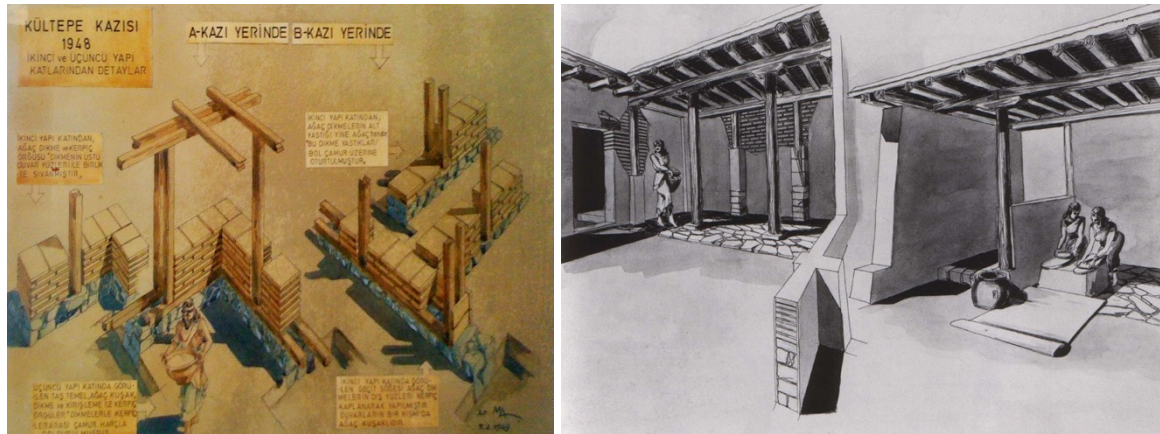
Kültepe/Kanesh, mudbrick masonry walls with vertical timber supports, also on the sides of the door and window openings from the Assyrian colony (Karum) period [left: 13; right: 14].
